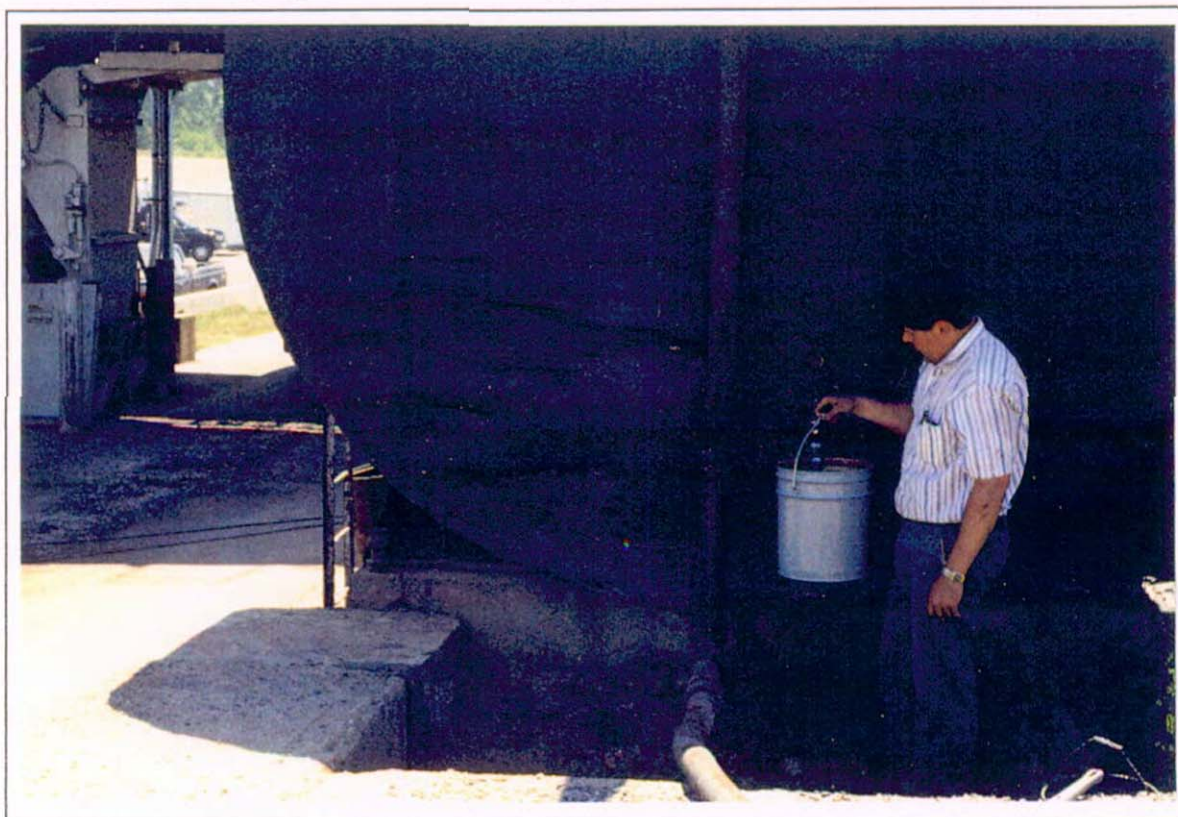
Sampling of the Asphalt Cement at the Asphalt Plant
